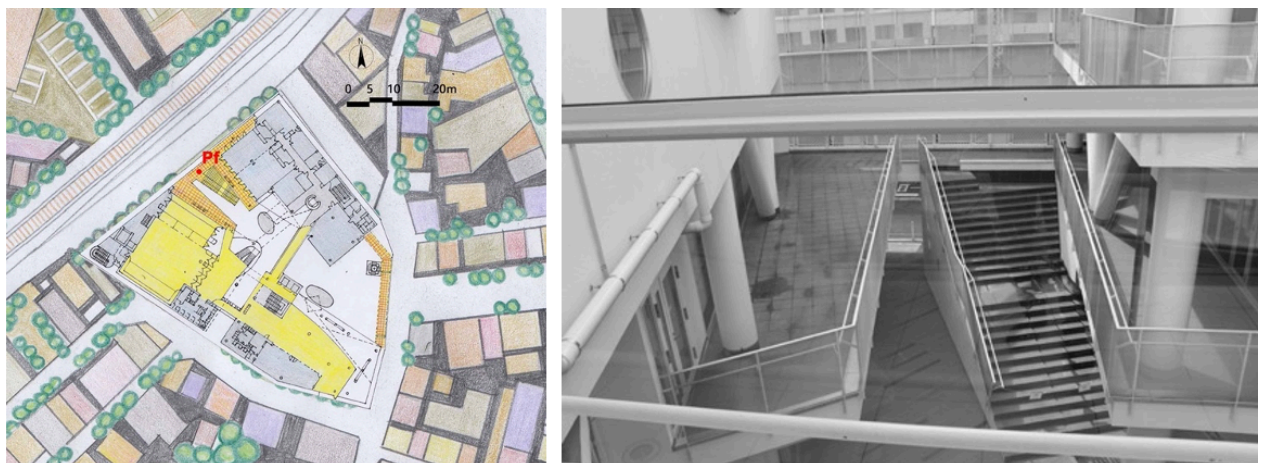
The platform (Pf) between the north and west building. (Source from: drawing and photo from the author)
